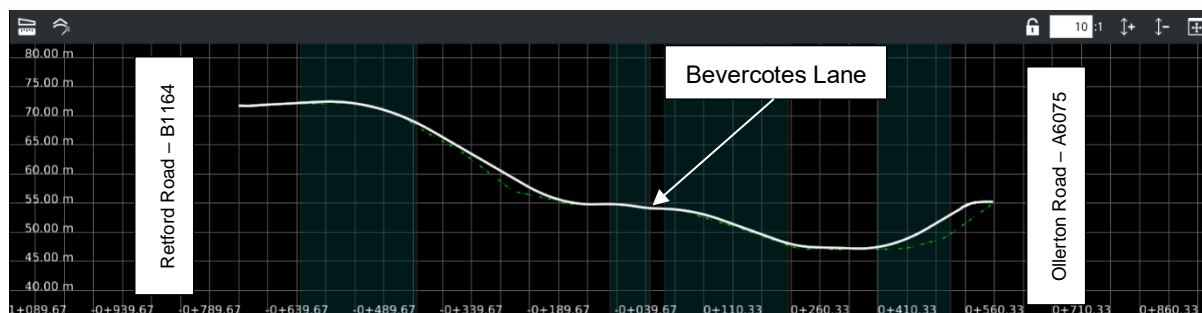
Topographical Information of the Proposed Bypass - OpenRoads ConceptStation
